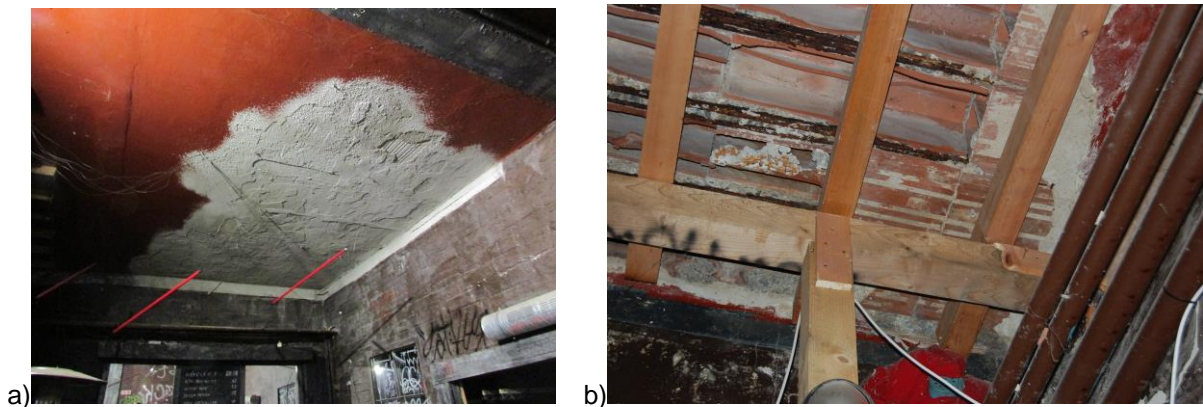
a) Repair of composite slab damage due to water infiltration, level 1NP north of column line 1 b) Temporary shoring of damaged composite slab system, level 1NP north of column line 1
